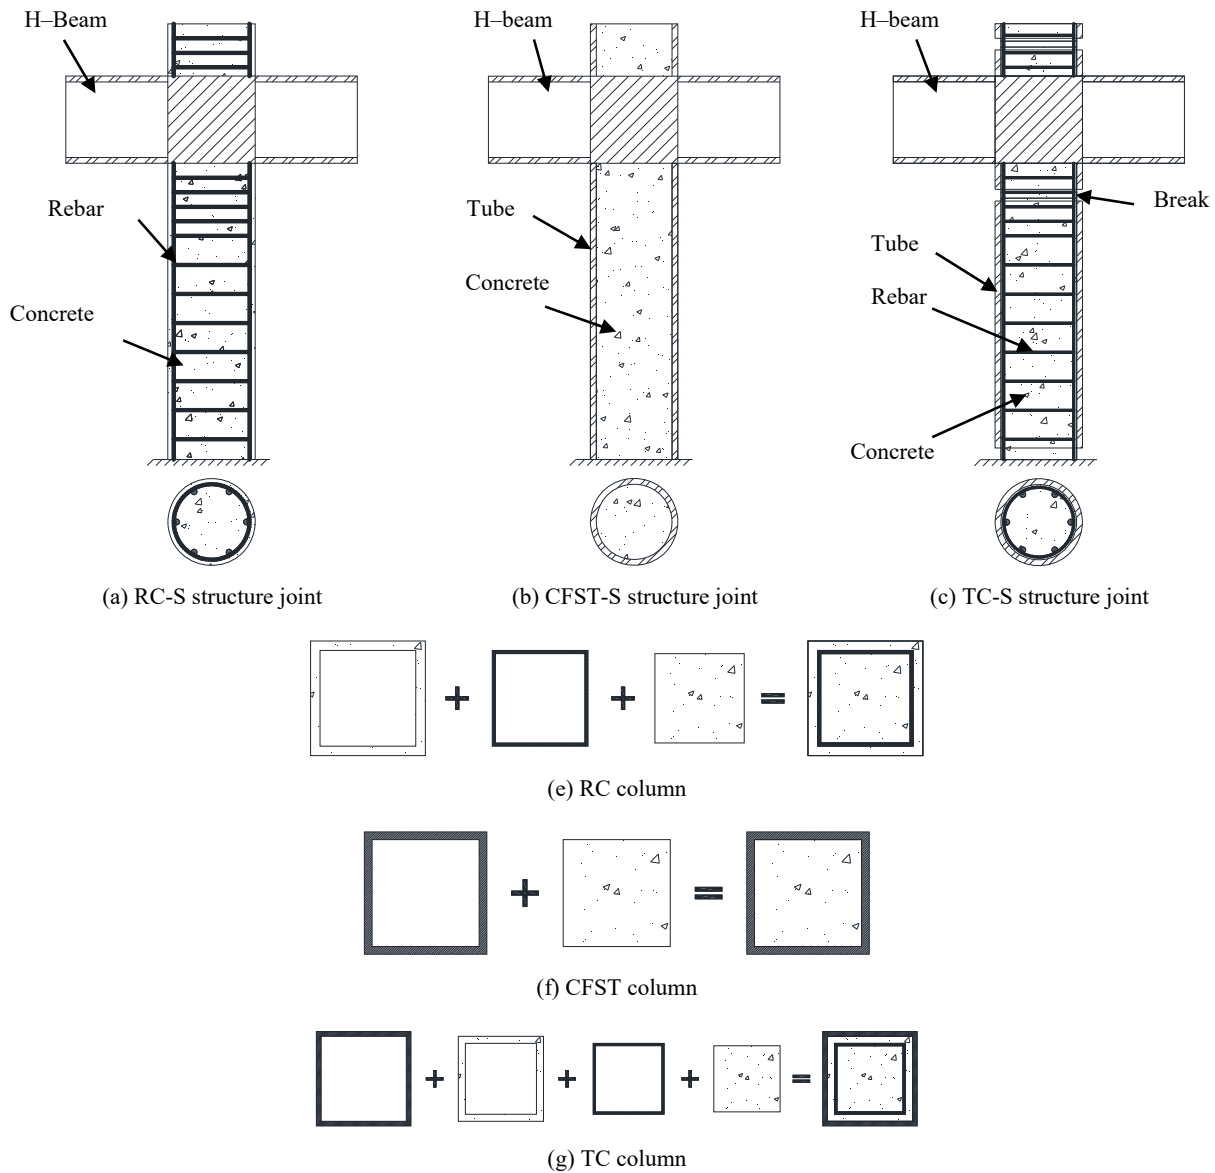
Schematic of RC-S hybrid structure, CFST-S hybrid structure, and TC-S hybrid structure
